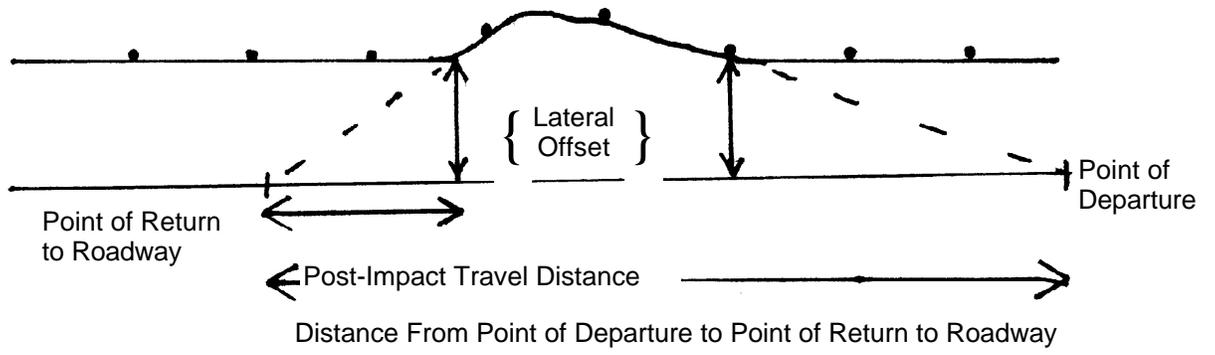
Distance data required for crashes producing asymmetric guardrail damage patterns.
